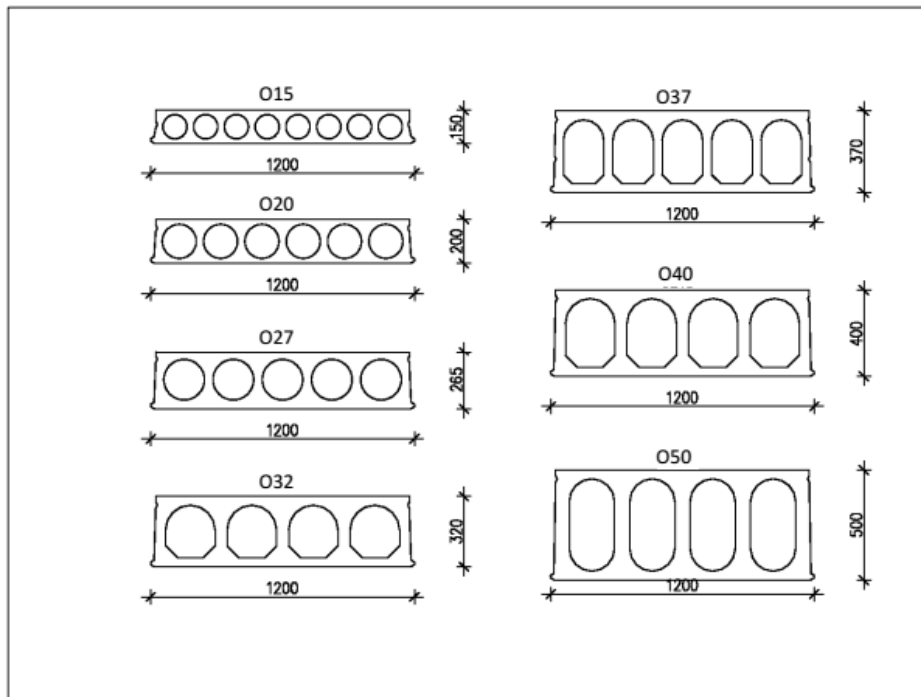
The typical hollow core slab type used in Finland. Reprinted from Parma (2013) [16]
